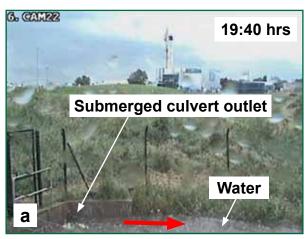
CCTV images of the CCHBC culvert outlet (images courtesy of CCHBC)
